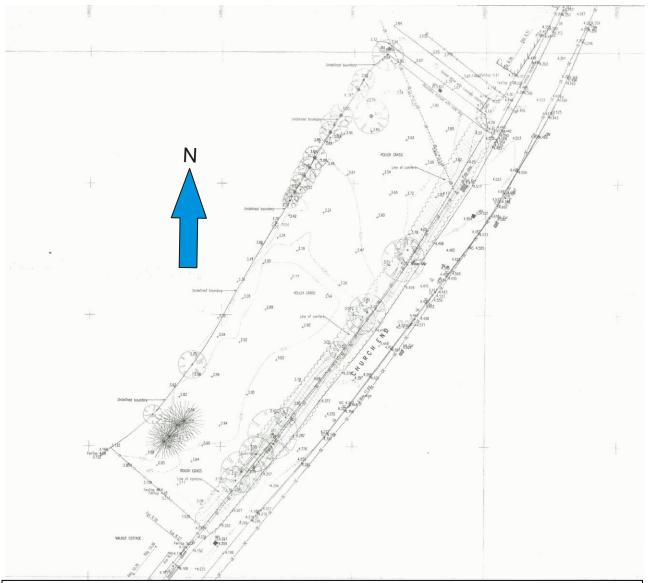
Plan showing the existing layout of the development site at an original scale of 1:200 at A1, (extract from Architects plan)
